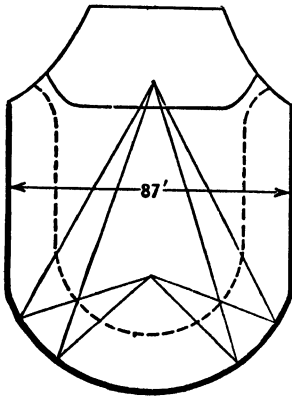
Plan of Queen's Hall, London, showing concentration of reflections from the rear wall.
